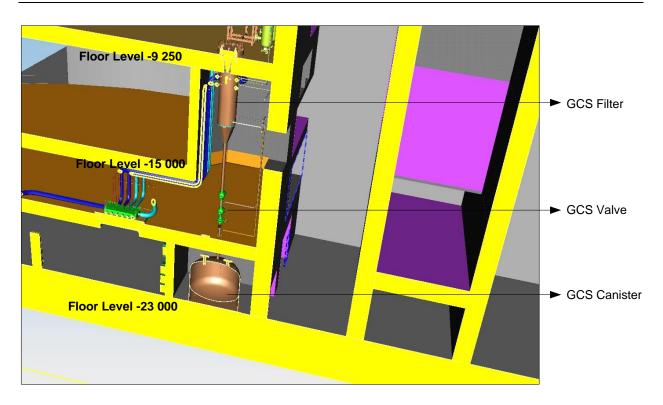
shows the orientation of the graphite dust storage tank or GCS canister room in the building. This room is located on the lowest level in the building.
